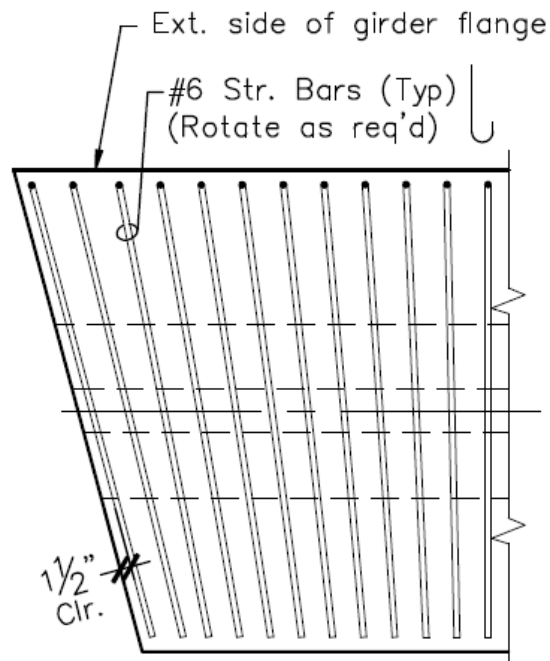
Typical top layer of flange reinforcement near end of girder – exterior girder.
